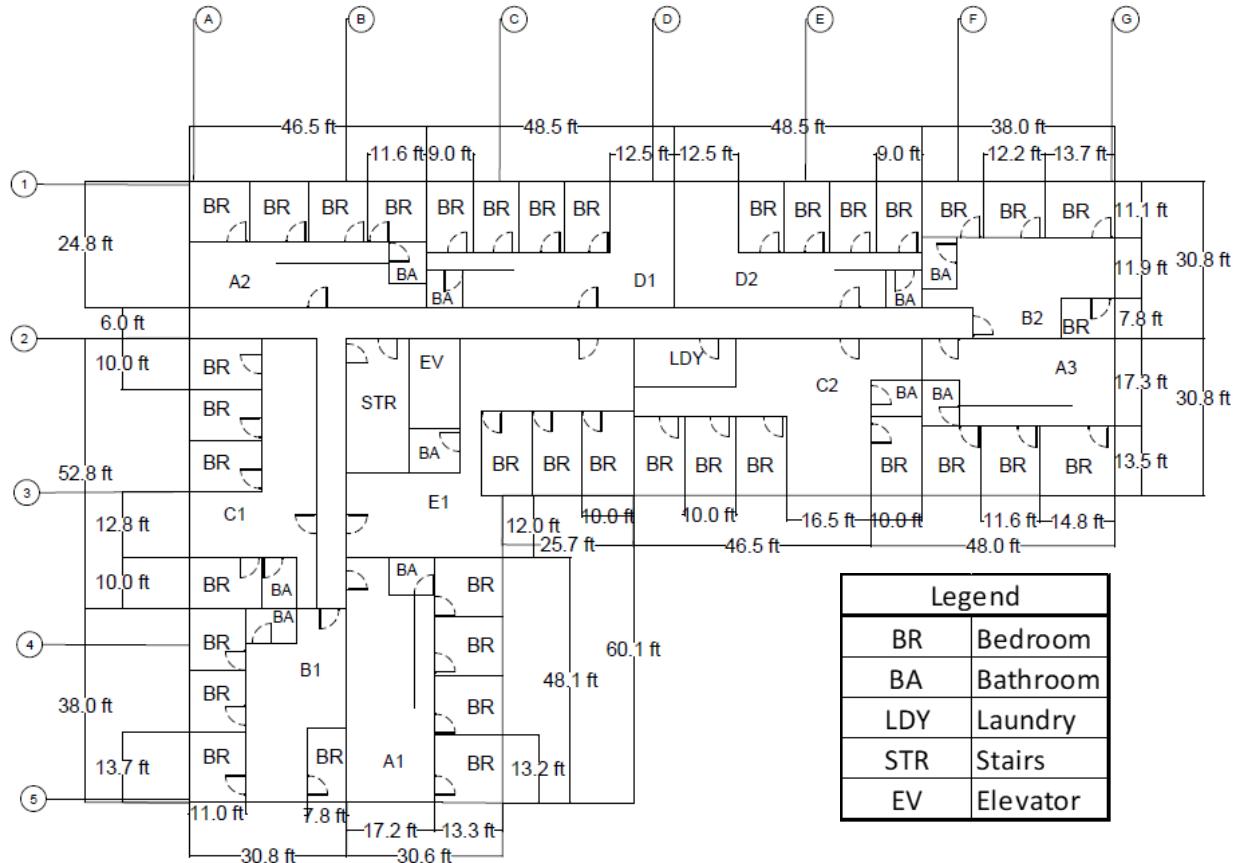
Architectural plan of floors two through eight of the multi-story building.
